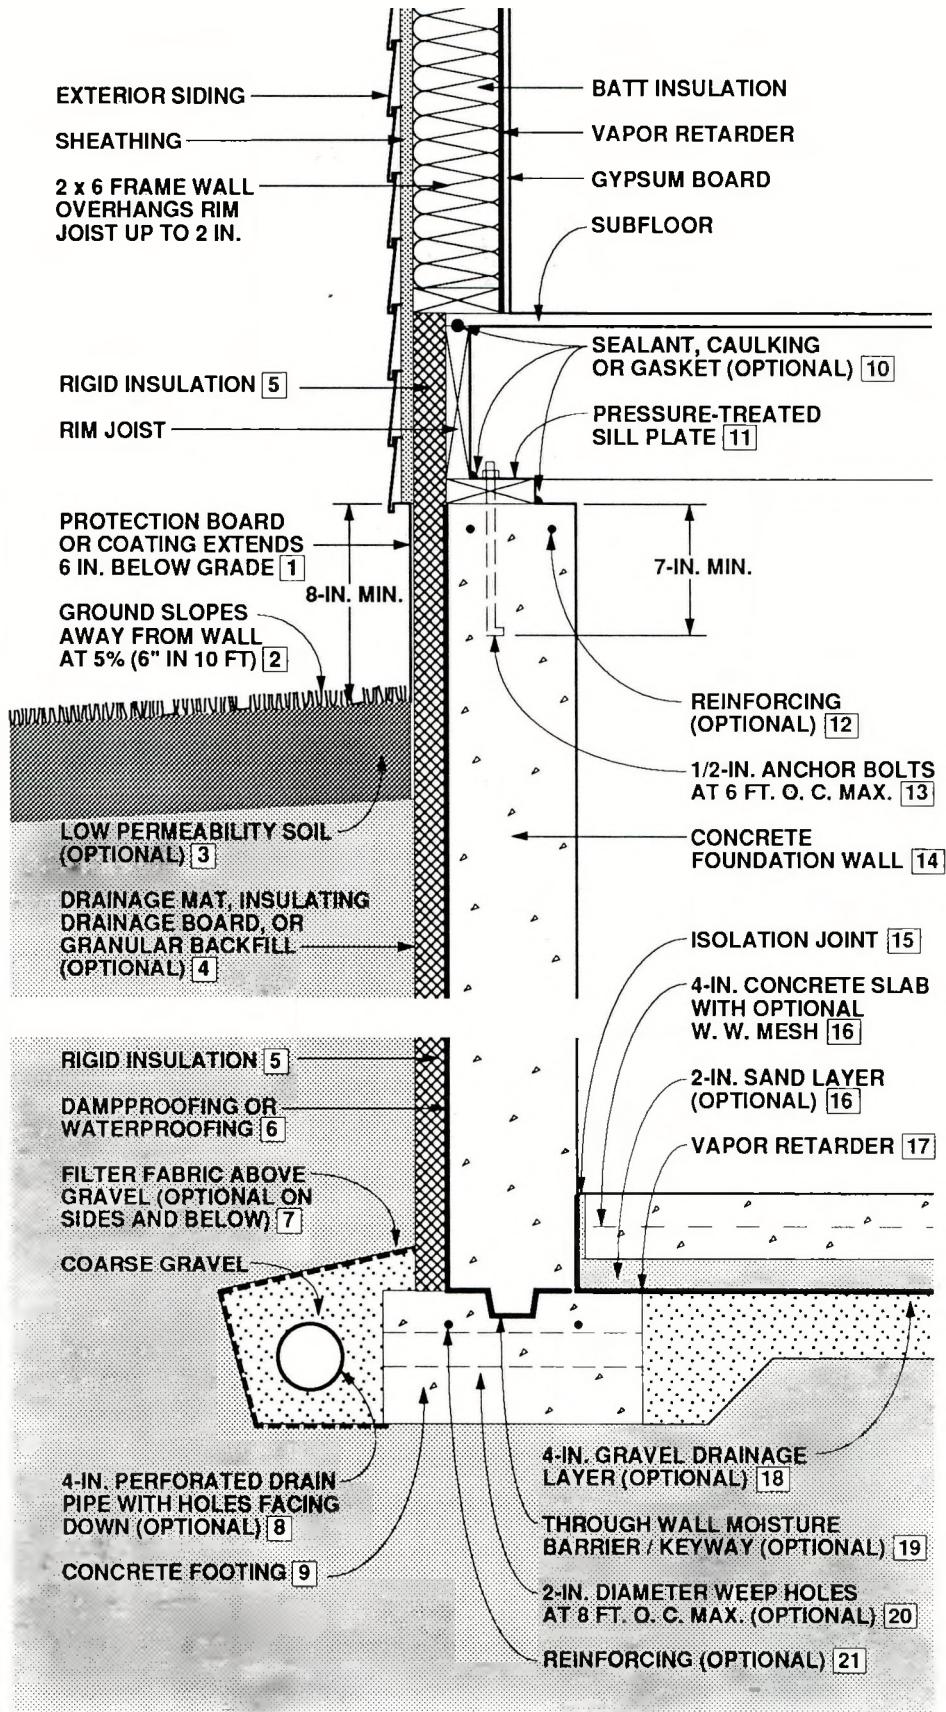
Concrete Basement Wall with Exterior Insulation
